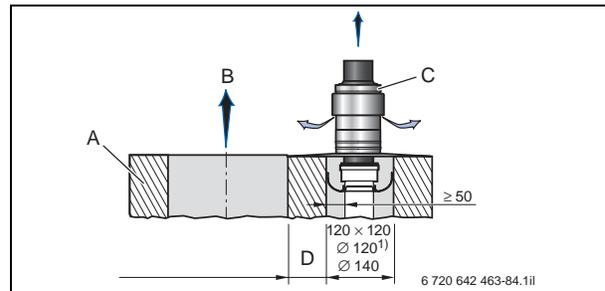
Minimum dimensions of the shaft cross-section and the shaft terminal for the flue (dim. in mm)
